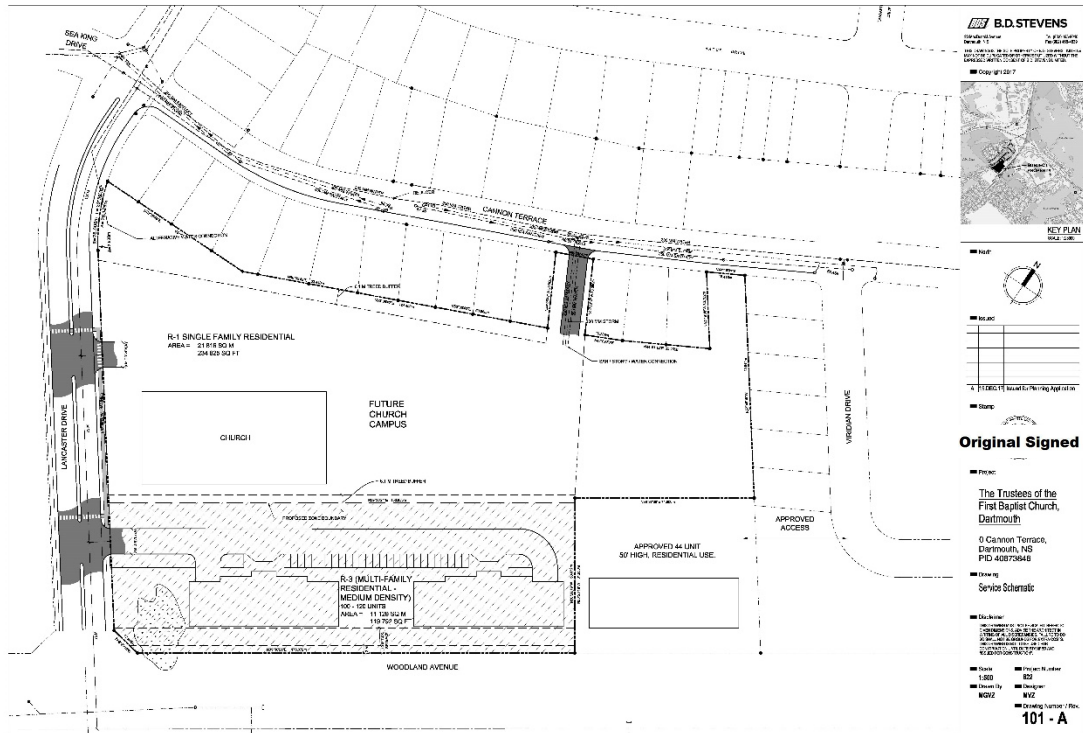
First Baptist Church Dartmouth Site Plan Rendering
